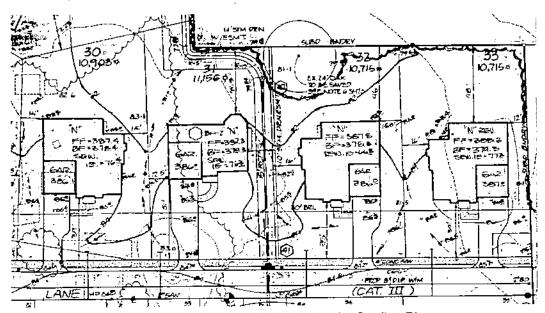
Sample Detail Required For Overlot Grading Plans
